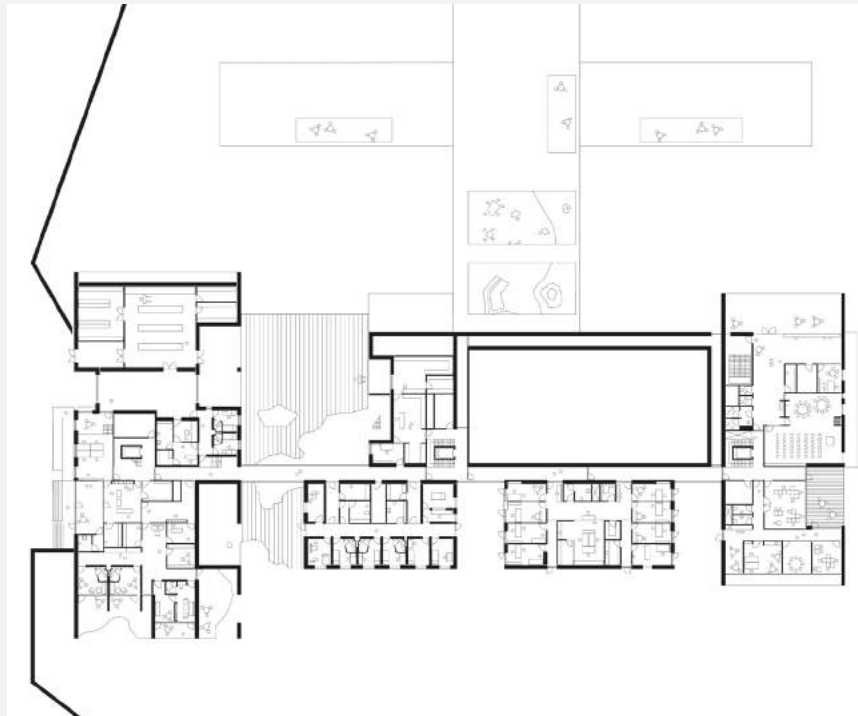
Anstalten Floor Plan (from *The Architectural Review*)
